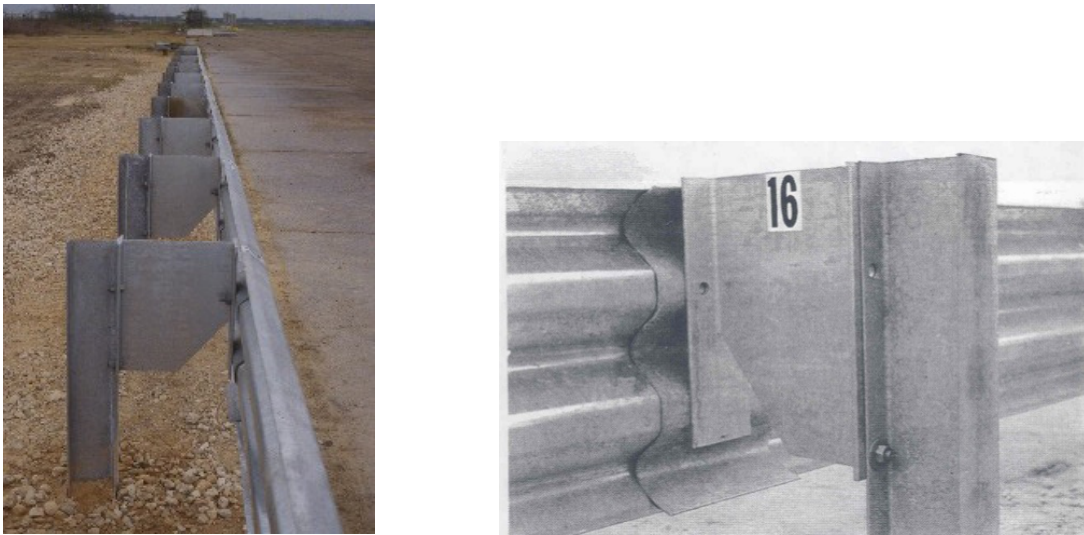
Typical modified Thrie-beam guardrail system (SGR09b)(6).
